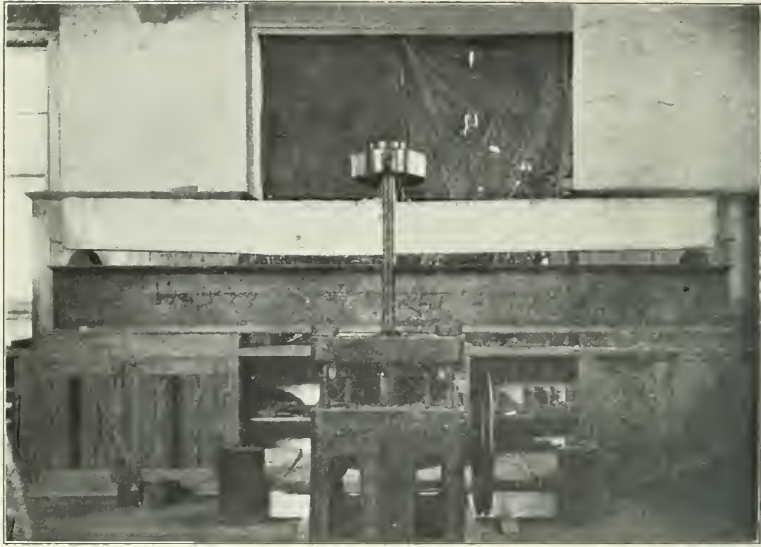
REINFORCED CONCRETE BEAM, AS SUBJECTED TO REPEATED LOADINGS.
